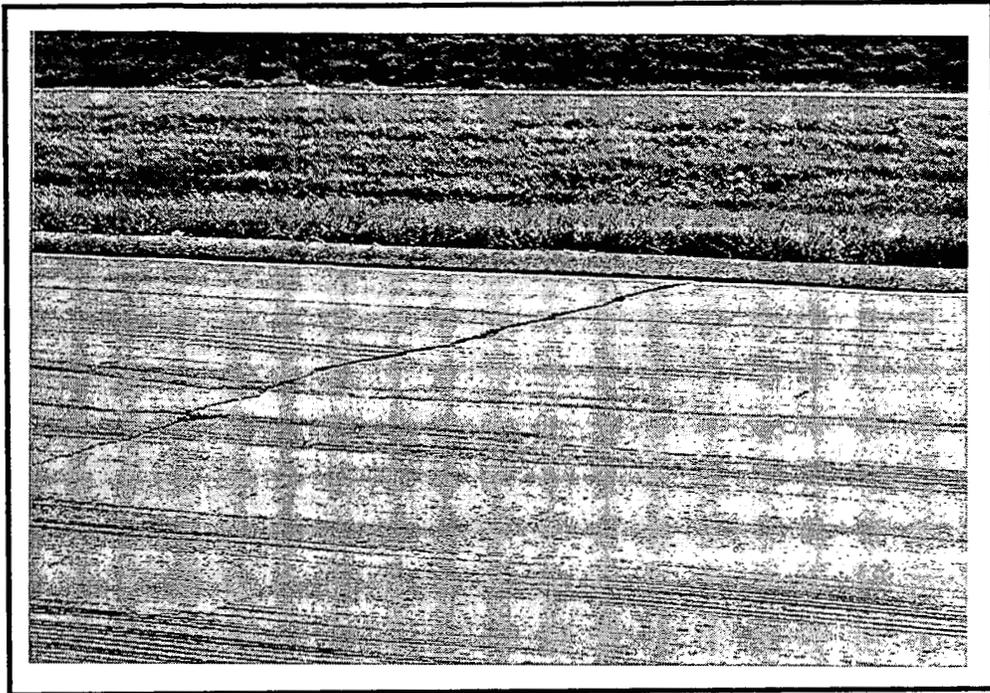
Transverse Cracks in CRC Pavement, Low Severity
